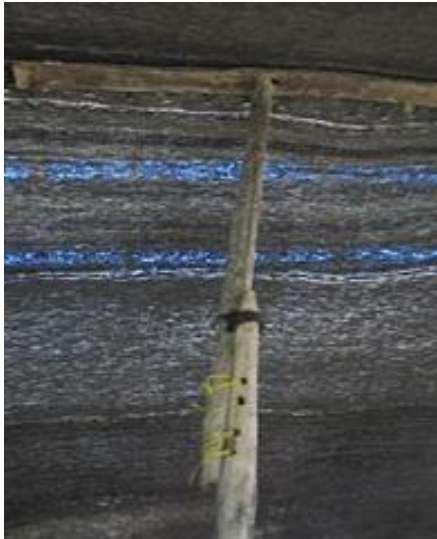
The central column of Arkovazi tent and ridge beam seated on the top of it, the construction covered with the roof fabric, photo by author
